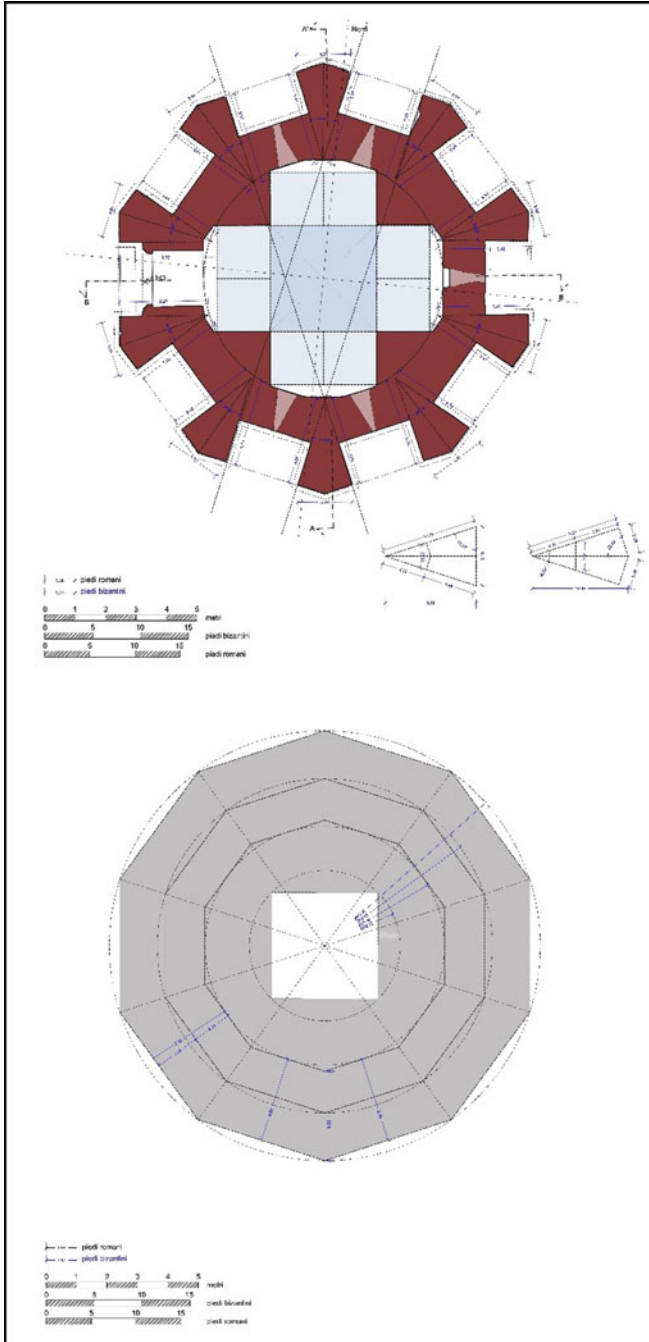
Plan of the first floor: geometry and measurements in Byzantine feet
